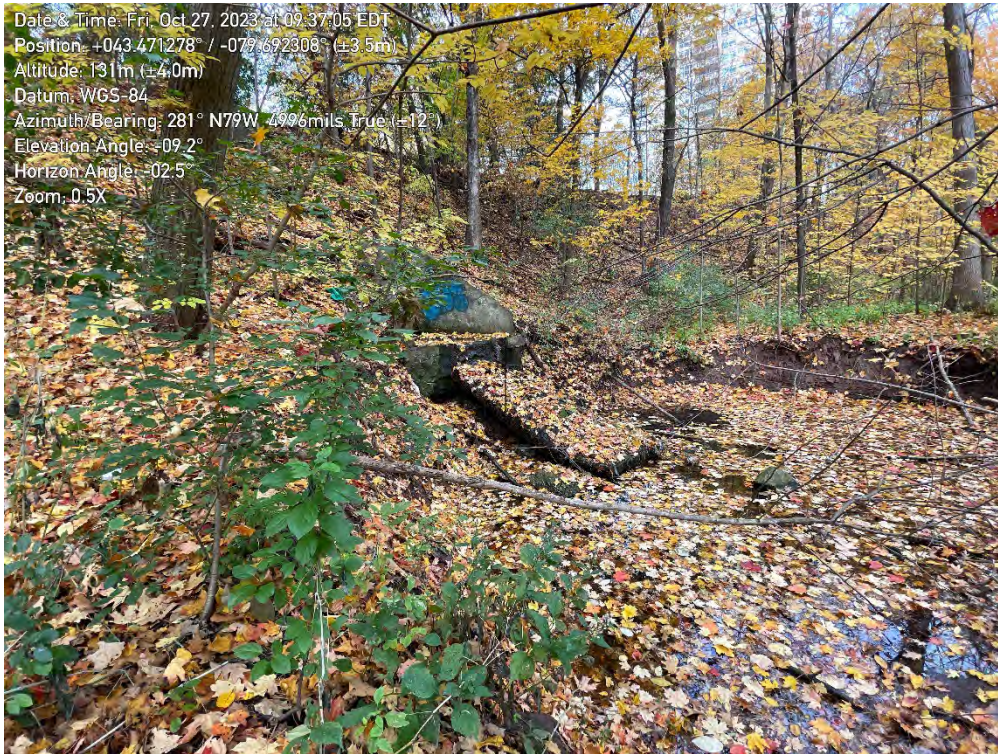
View of failed outflow culvert in Zone A7 of the East Morrison Creek, looking Northwest.
